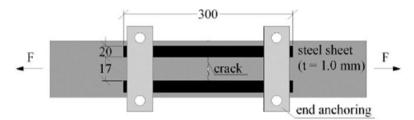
Centre-notched specimens with single-sided adhesively bonded CFRP strips and end anchoring [10]
